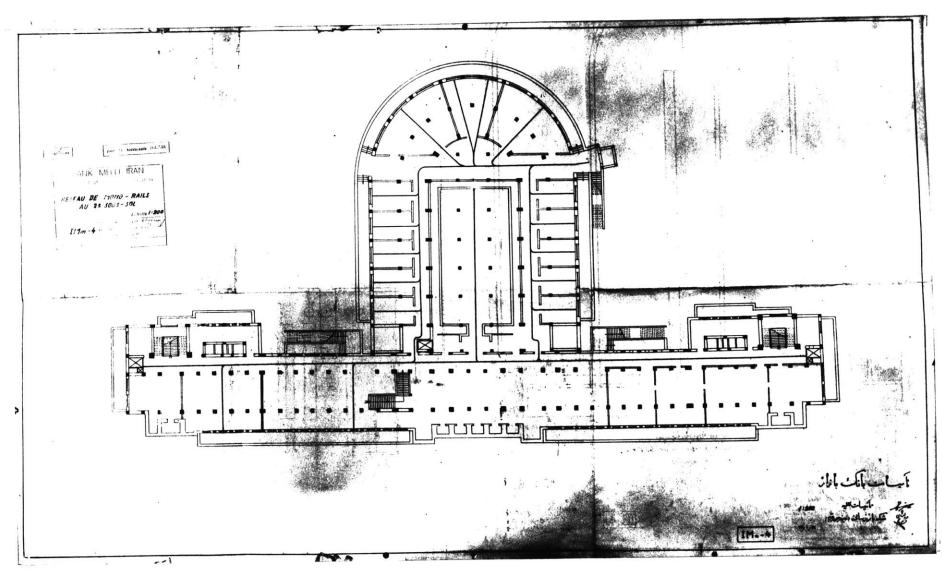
Floor plan of the Bank Melli Bazaar
